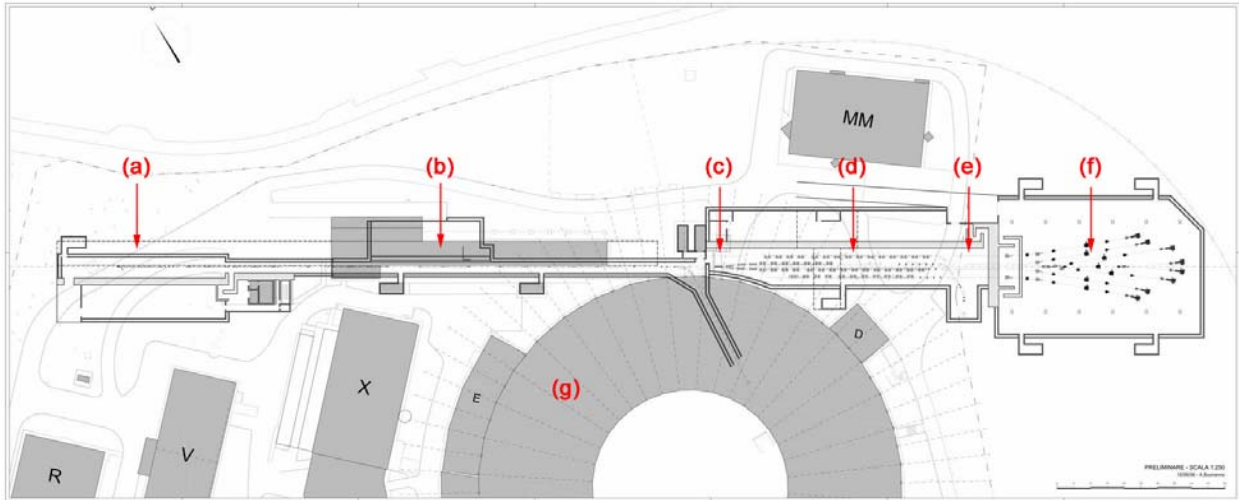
Schematic FERMI layout beside the ELETTRA storage ring building (g). See text for details.
